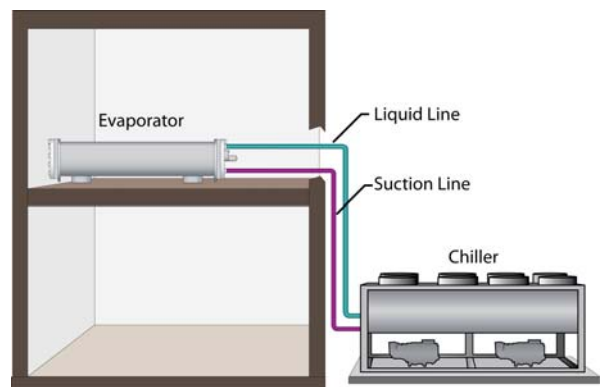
Typical Air-Cooled Chiller with Remote Evaporator
